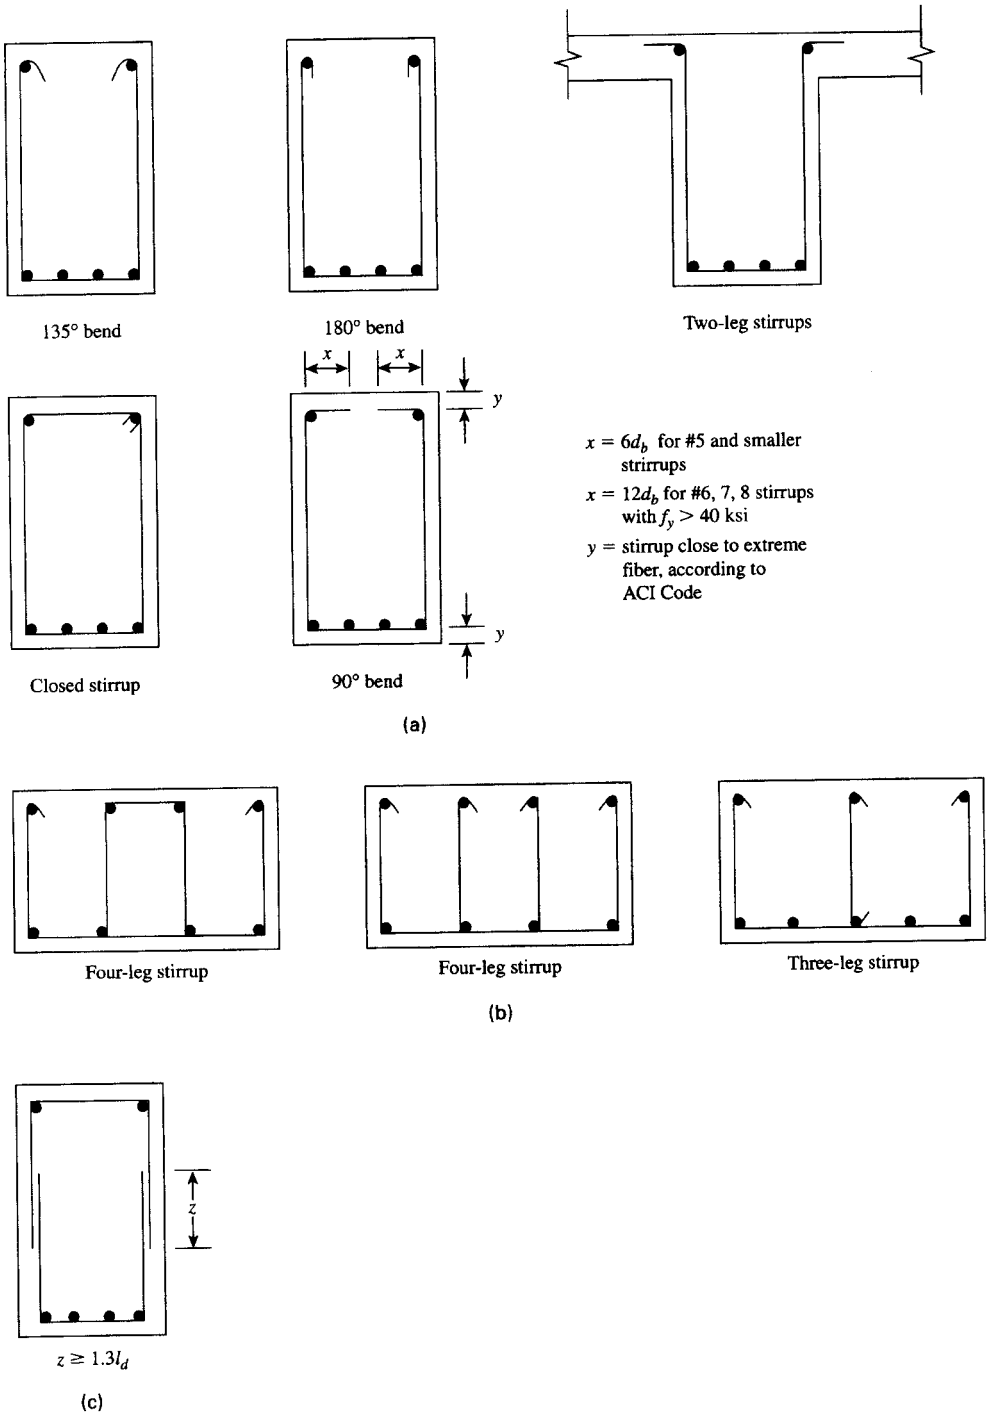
Stirrup types: (a) U-stirrups enclosing longitudinal bars, anchorage lengths, and closed stirrups, (b) multileg stirrups, and (c) spliced stirrups.
